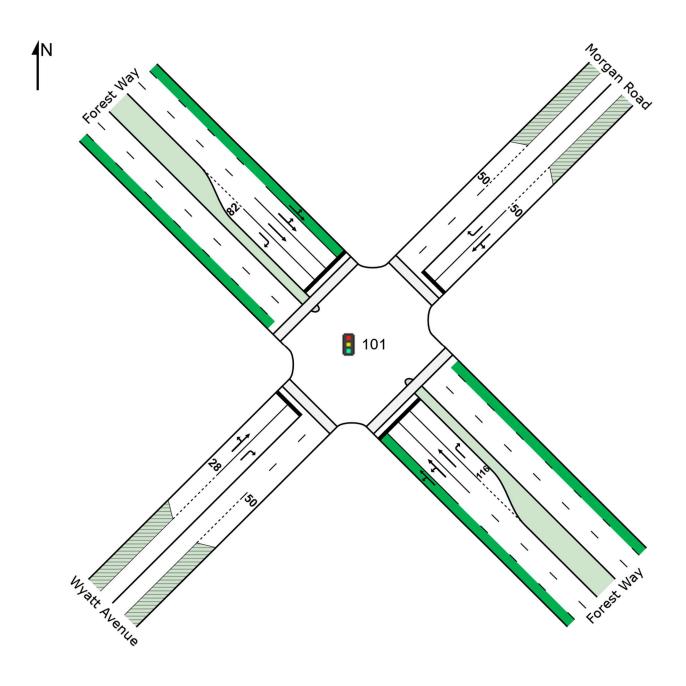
Signalised Intersection Layout of Forest Way with Morgan Road and Wyatt Avenue (SIDRA)
